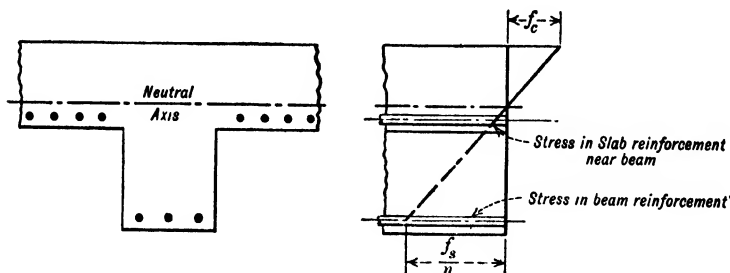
Action of Beam and Slab Reinforcement in Flat Slab Construction.
